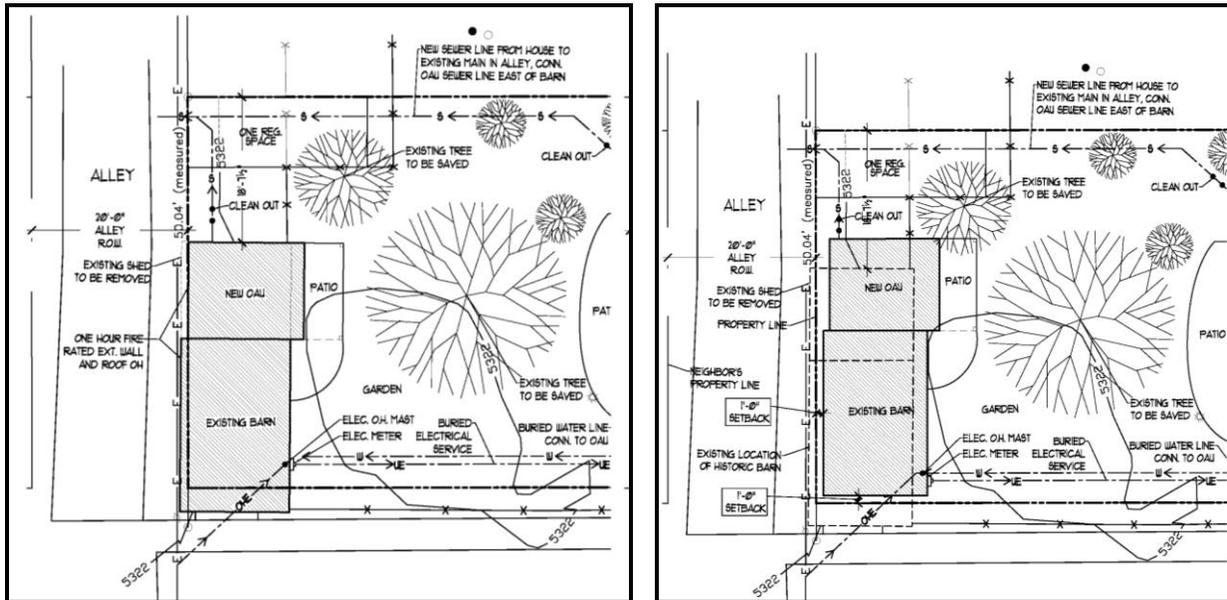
Existing (L) and proposed (R) site plans. Not to scale.
